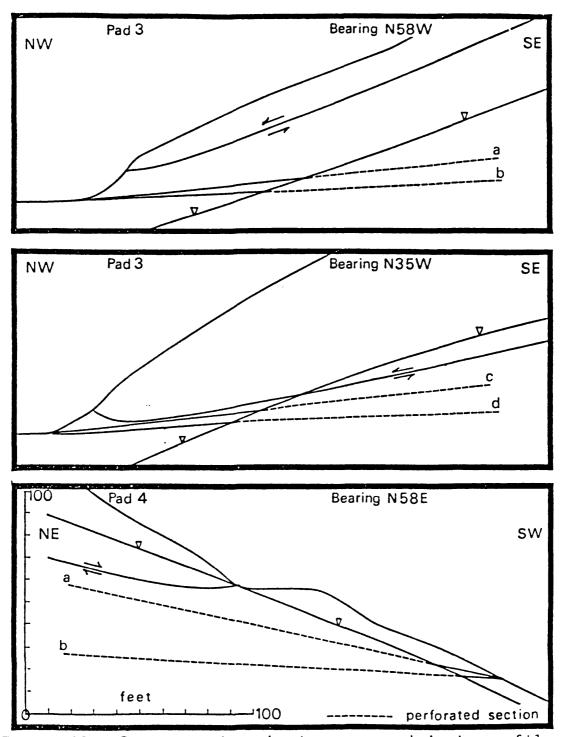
Cross section showing proposed drain profiles from drill pads 3 and 4.
